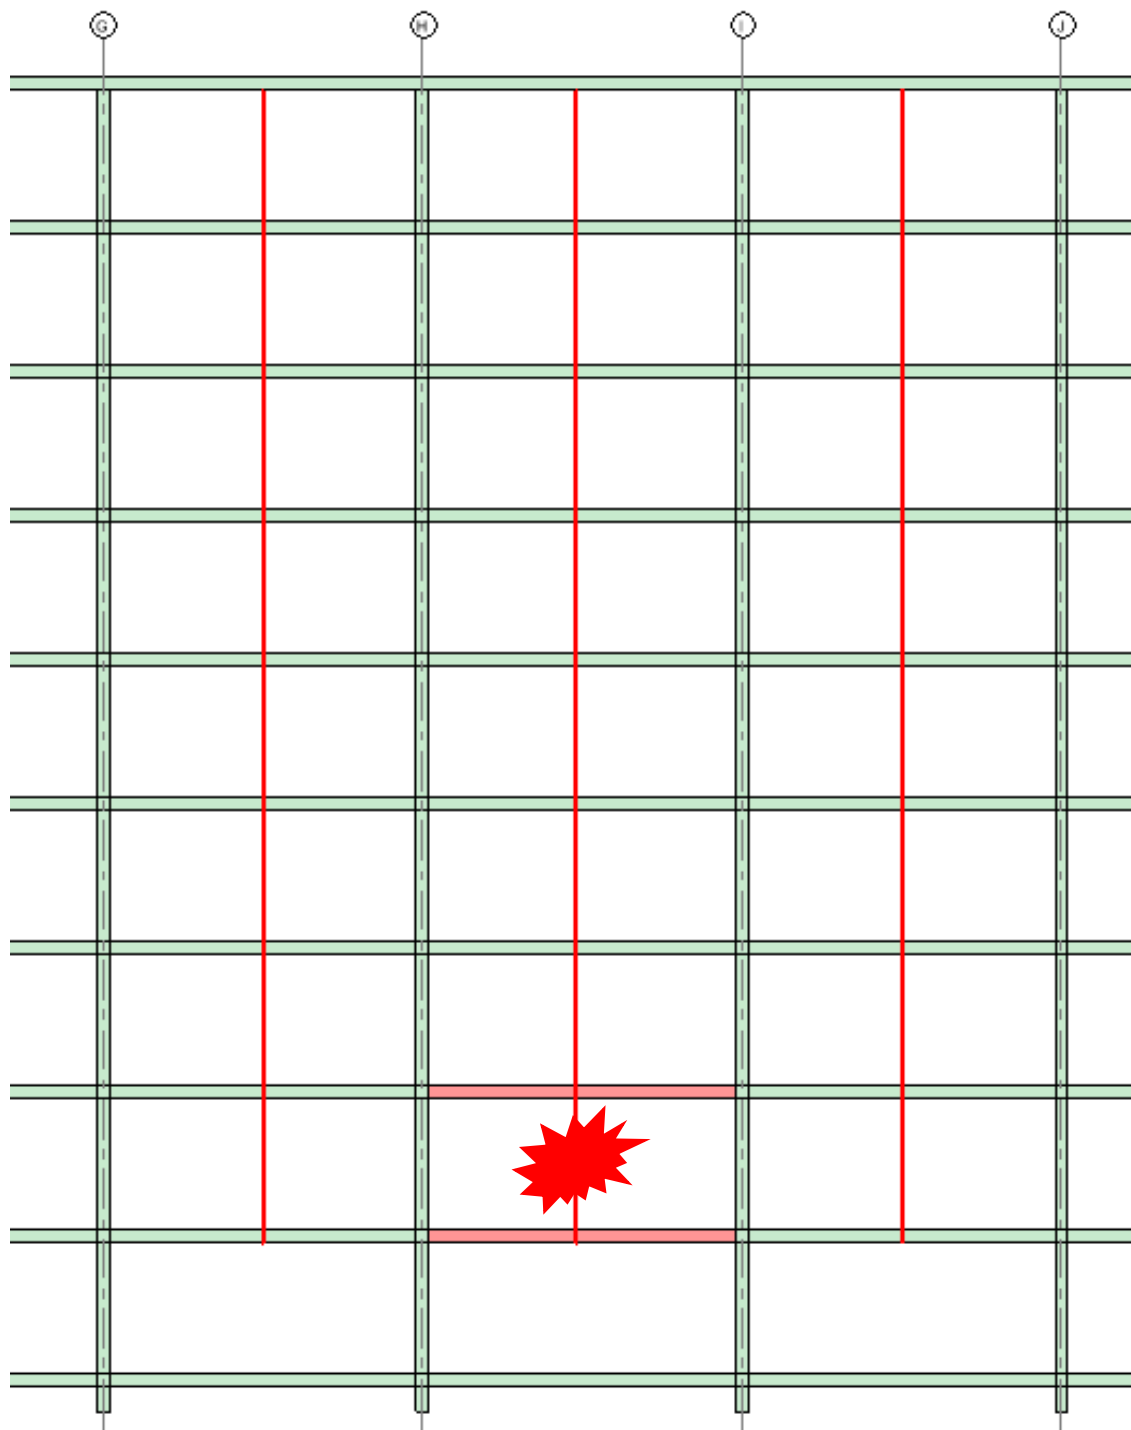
Collapse mechanism if fire event occurs within an internal flat at level 1, Haviland & John Cozens house (elevation)
